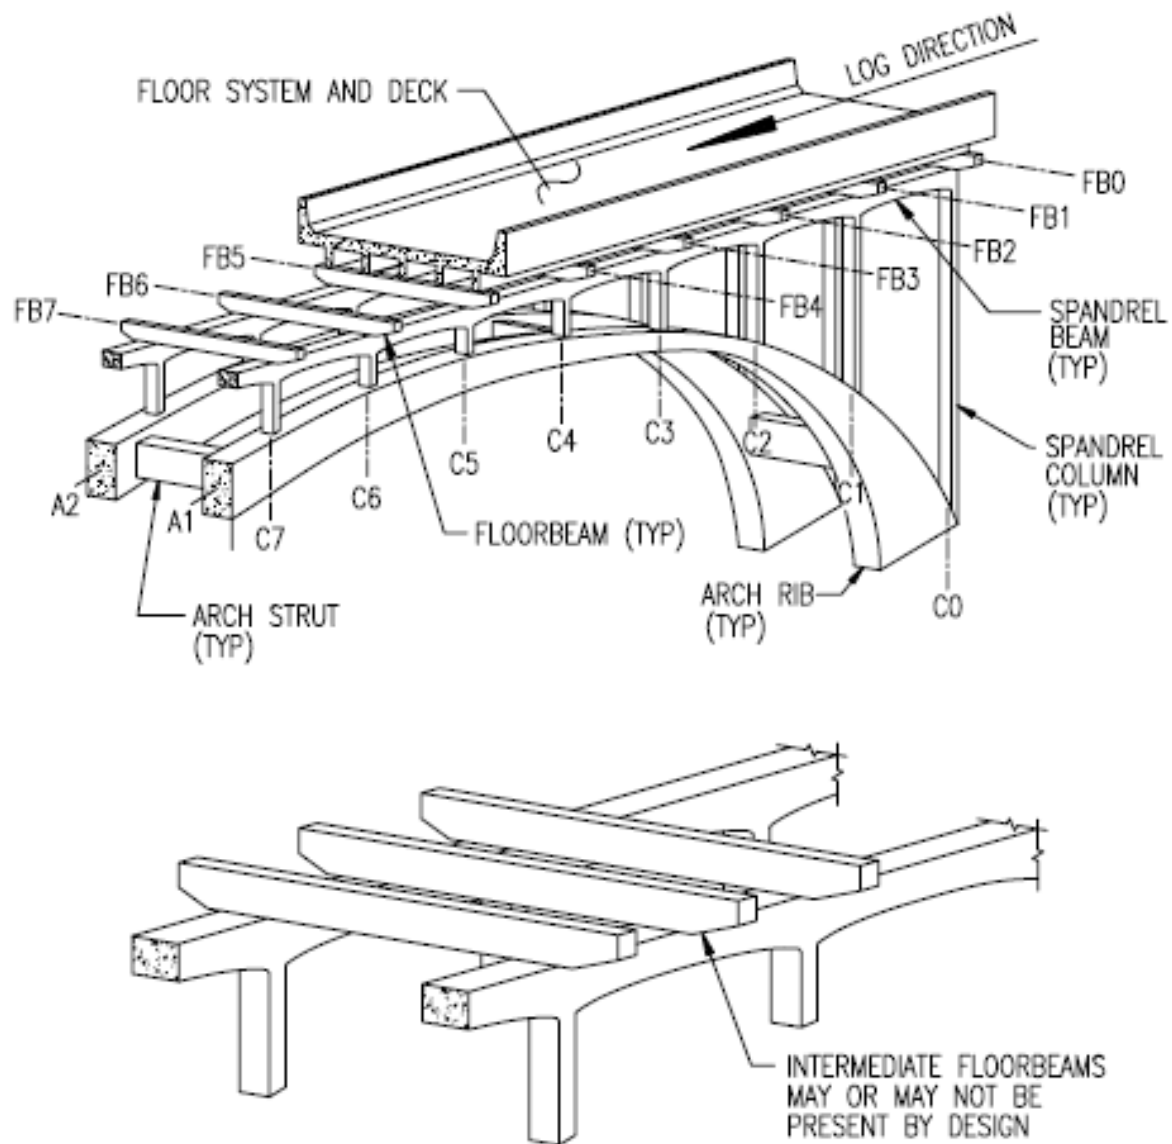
Open Spandrel Concrete Arch Bridge Components.
